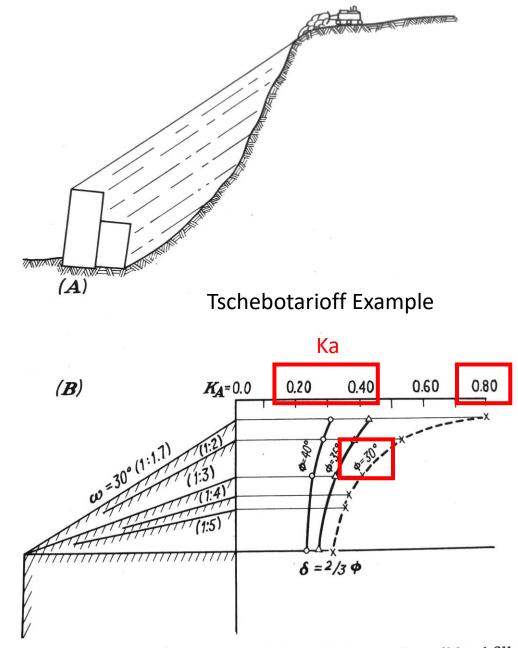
(A) Damage to a 24-ft-high (7.3-m) crib wall backfilled by sand bulldozed over the edge of slope. (B) Explanation of the causes of trouble in (A).
